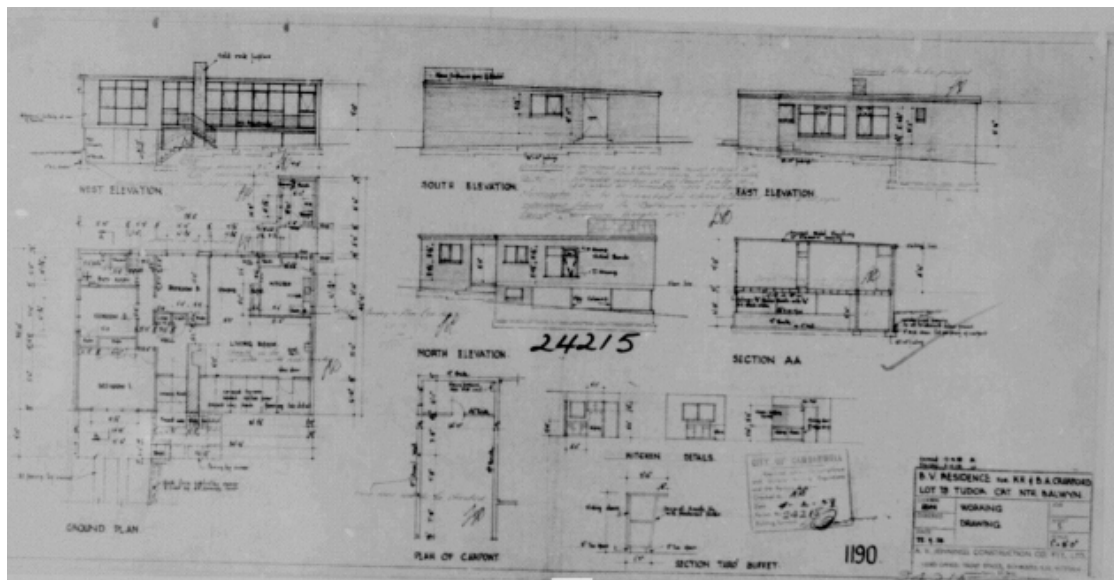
Working drawing for 17 Trentwood Avenue, North Balwyn showing plan and elevations. Note drawing is title blocked AV Jennings and the address is Tudor Court. (Source: BP 24212)
